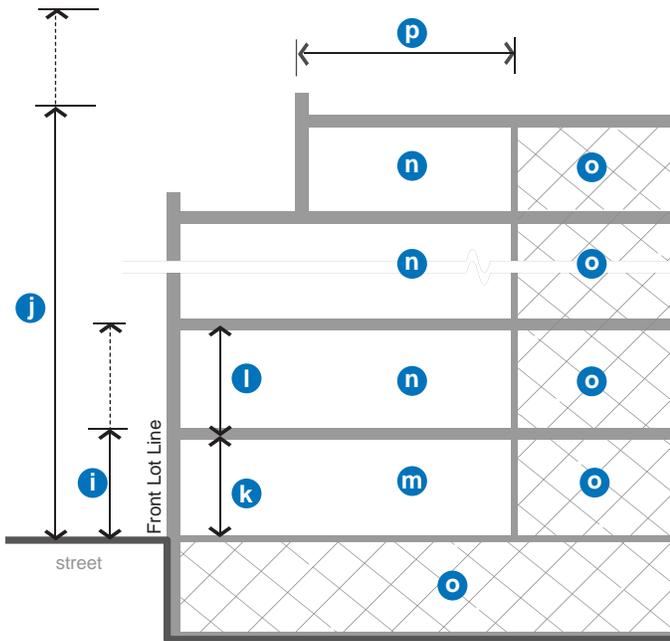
(2) Mid Scale Shop Building: Height and Use Requirements
